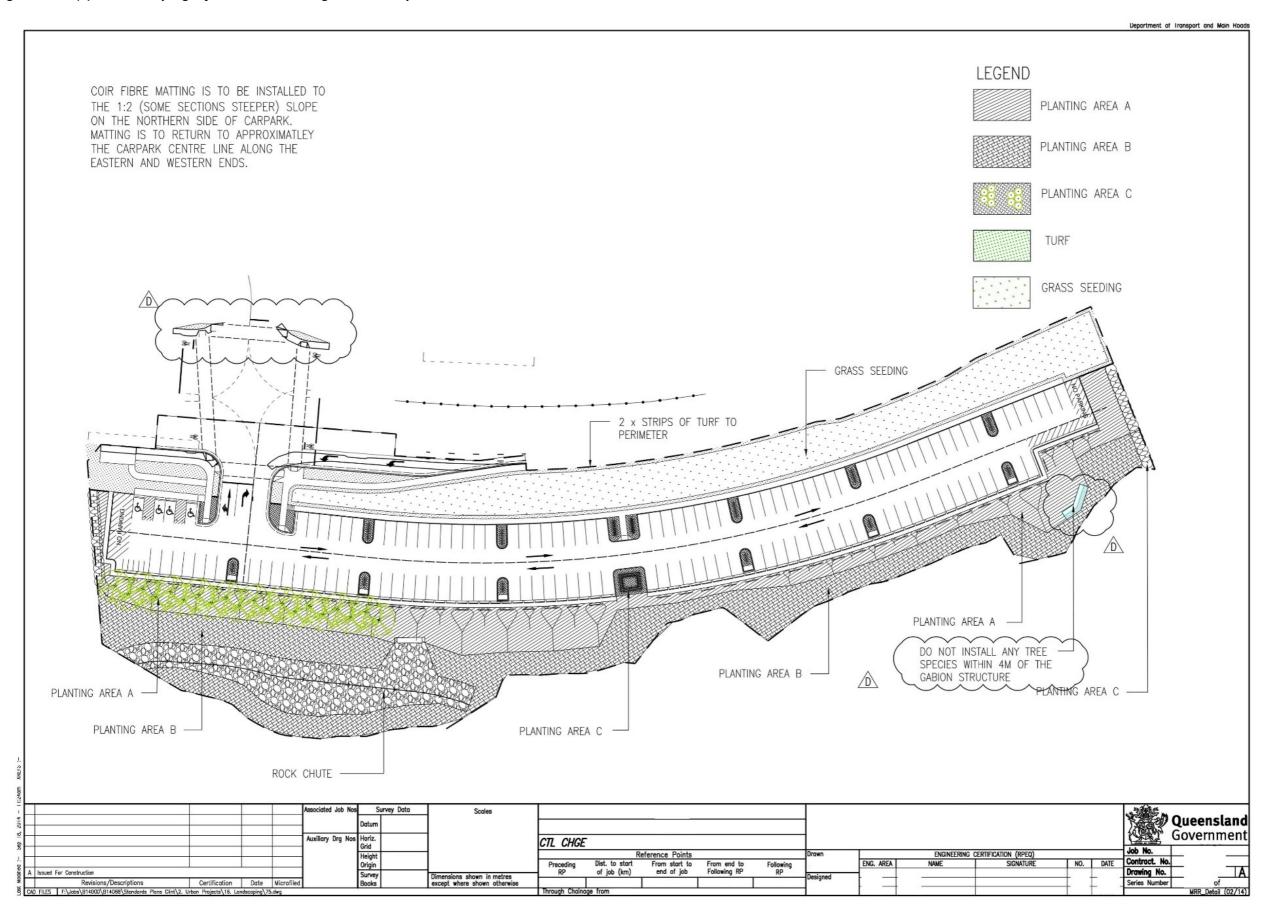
(e) – Landscaping layout and details – generic example 5
